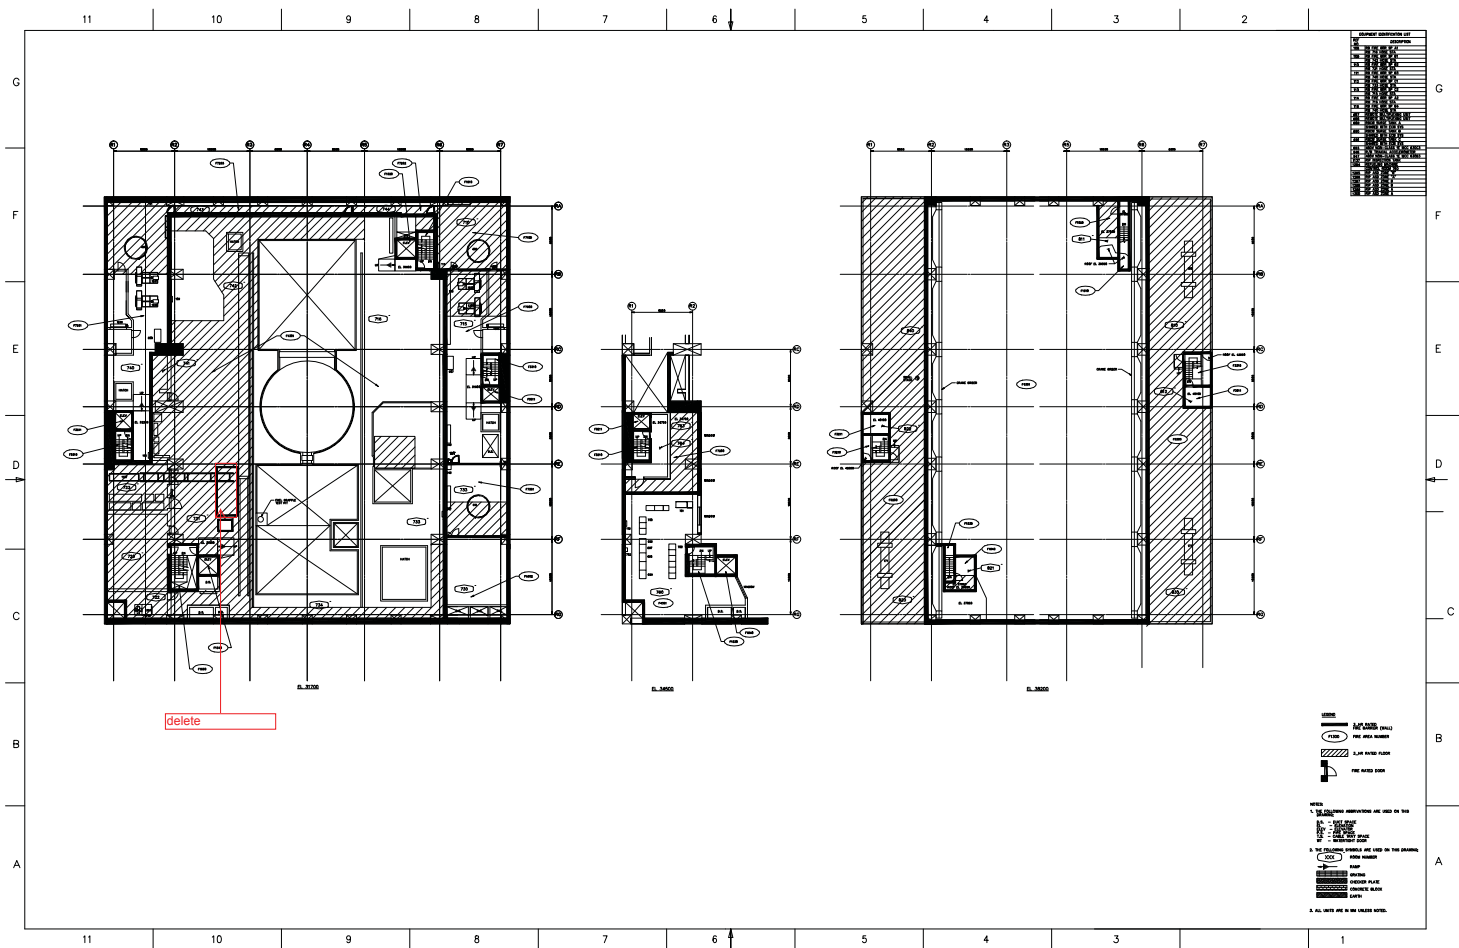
A.4-8 REACTOR BUILDING FIRE PROTECTION AT ELEVATION 31700/38200mm
